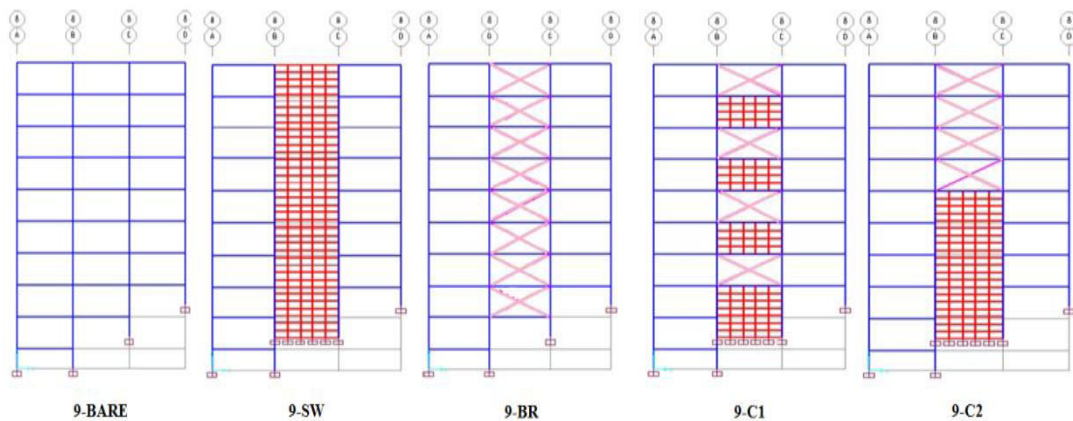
9 Storey models with bare frame(9-BARE), shear wall(9-SW), bracings (9-BR),combination 1(9-C1) & combination 2(9-C2)
